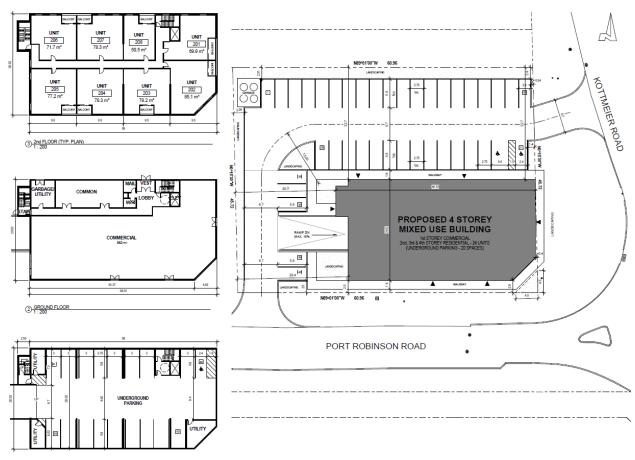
Excerpt from Site Plan concept submitted with application (source: applicant)
